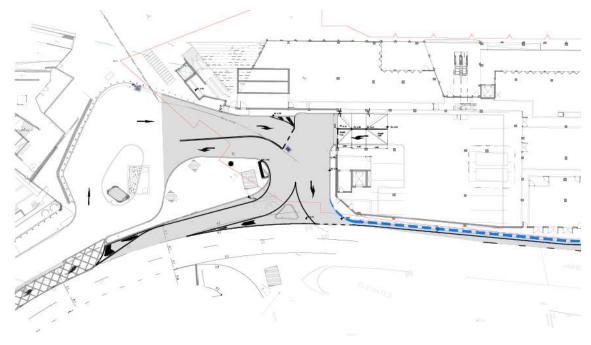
Cockle Bay Park loading dock (Source: Enstruct, CBP-SK-ENS-CIV-DRW-20-1011-01, 31/08/2021)
